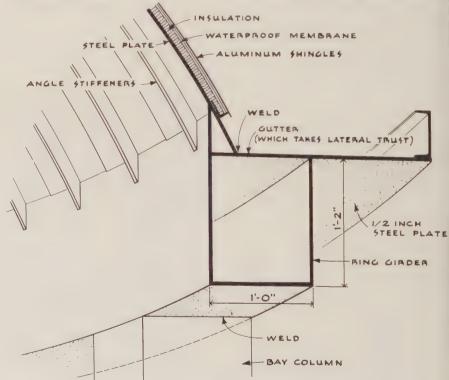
An architect's sketch illustrates the detail of the Auditorium facia tension ring at the circumference of the outer dome. As is typical with many of the Technical Center buildings, the structural steel has continuously welded connections, and, as shown here, the steel remains exposed as a design feature. The ½-in. steel plate dome is weather tight; however, it is covered with weathering aluminum shingles and insulation for economy in heating and air conditioning.
